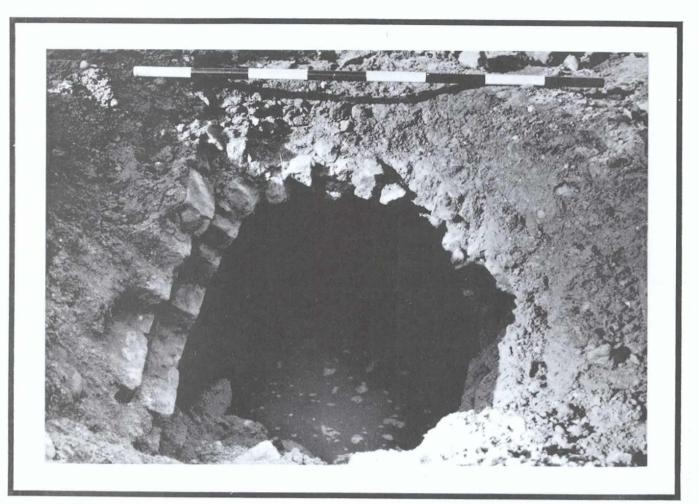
BRICK SEWER UNDER BEACH STREET. NOTE DOMED CONSTRUCTION (L. Shmookler 2/85)
